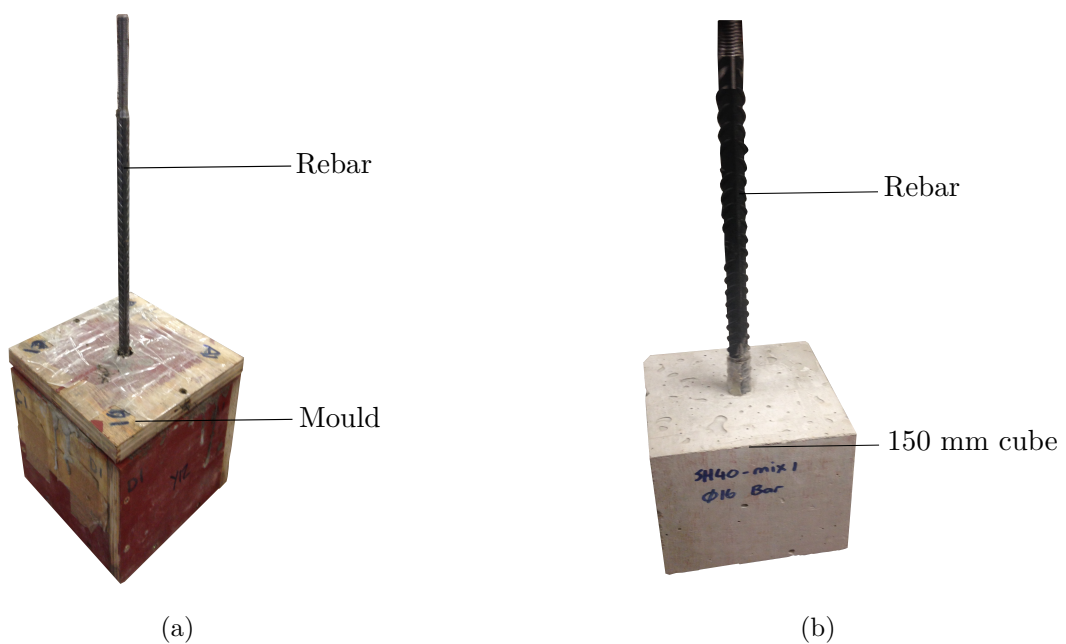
(a) PO specimen moulds, and (b) Demoulded PO specimen
